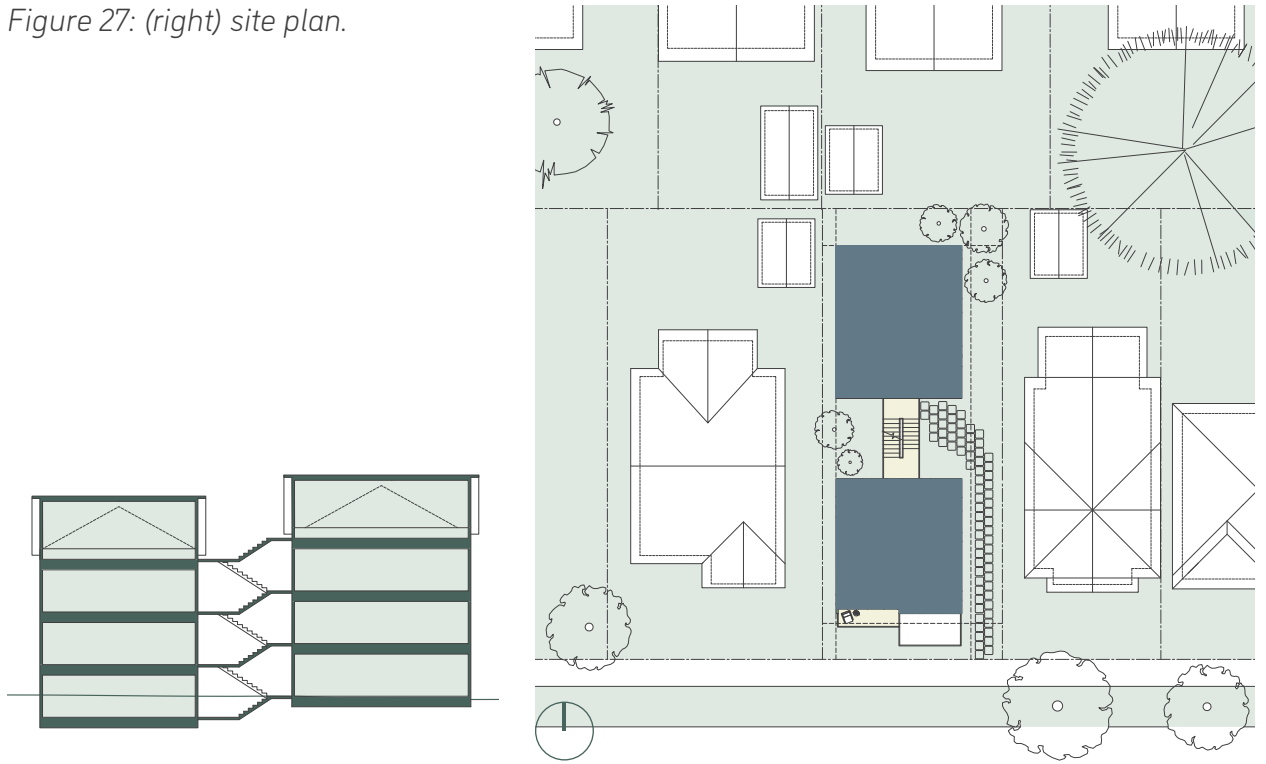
(above) North/South section. Figure 29: (below) rendering of street facing facade.
